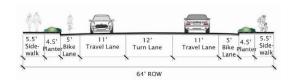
Typical Road Section Source: Gualala Community Action Plan Phase II Downtown Design Plan (2009)
